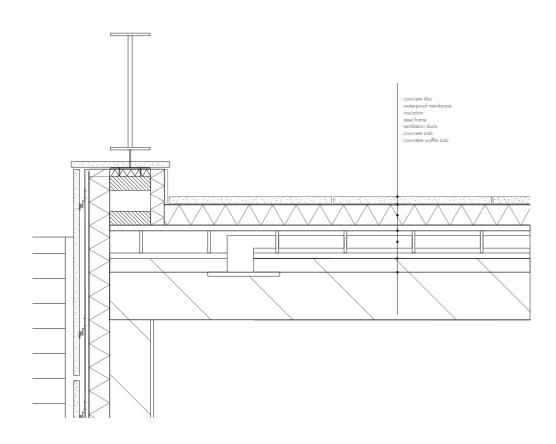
Detail roof top pavilion Fig. 33. Detail roof bottom level
